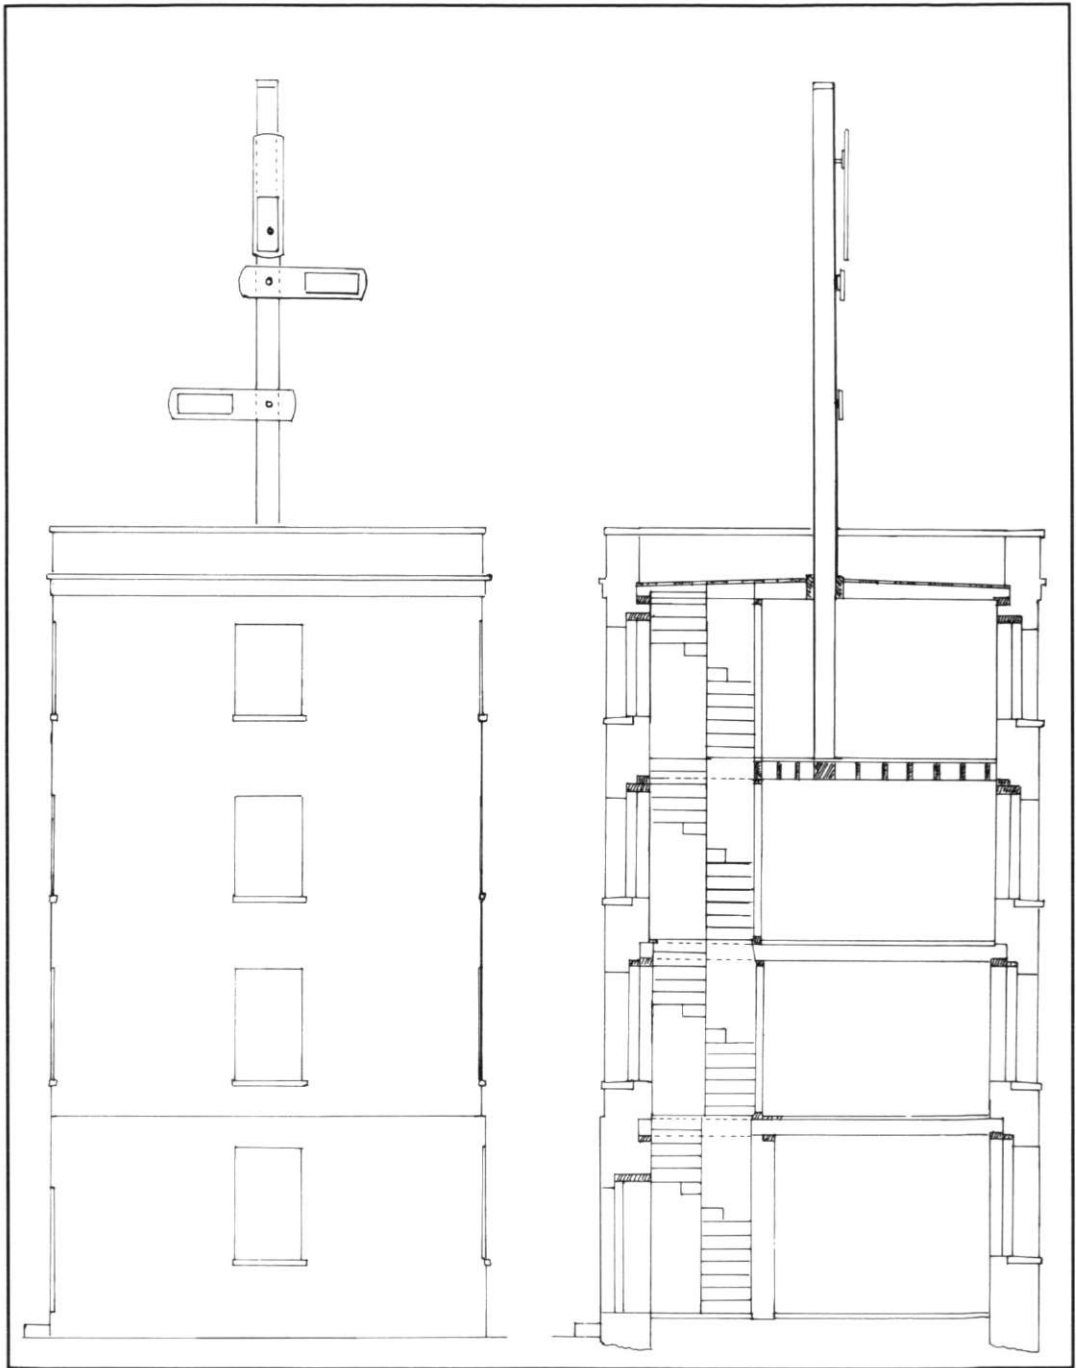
Elevation and section of Newford Down Semaphore Tower. Each floor has a closet under the stairway. From drawing captioned '... a signal tower proposed to be erected at Newford Down...' PRO ADM 140/655.
